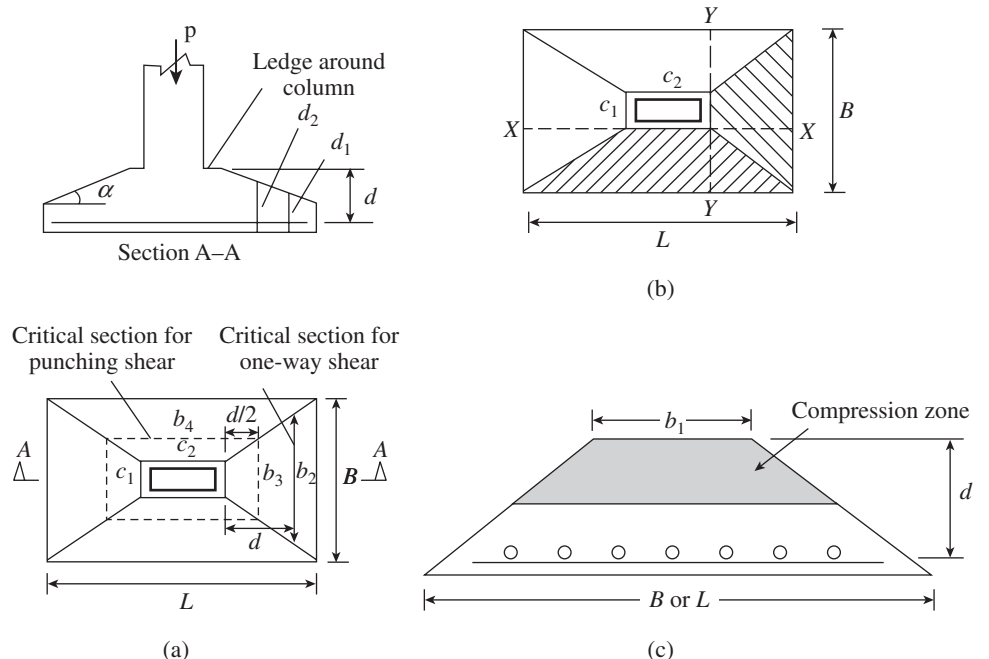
Sloped rectangular footing (a) Sloped footing (b) Critical sections for bending (c) Trapezoidal section
